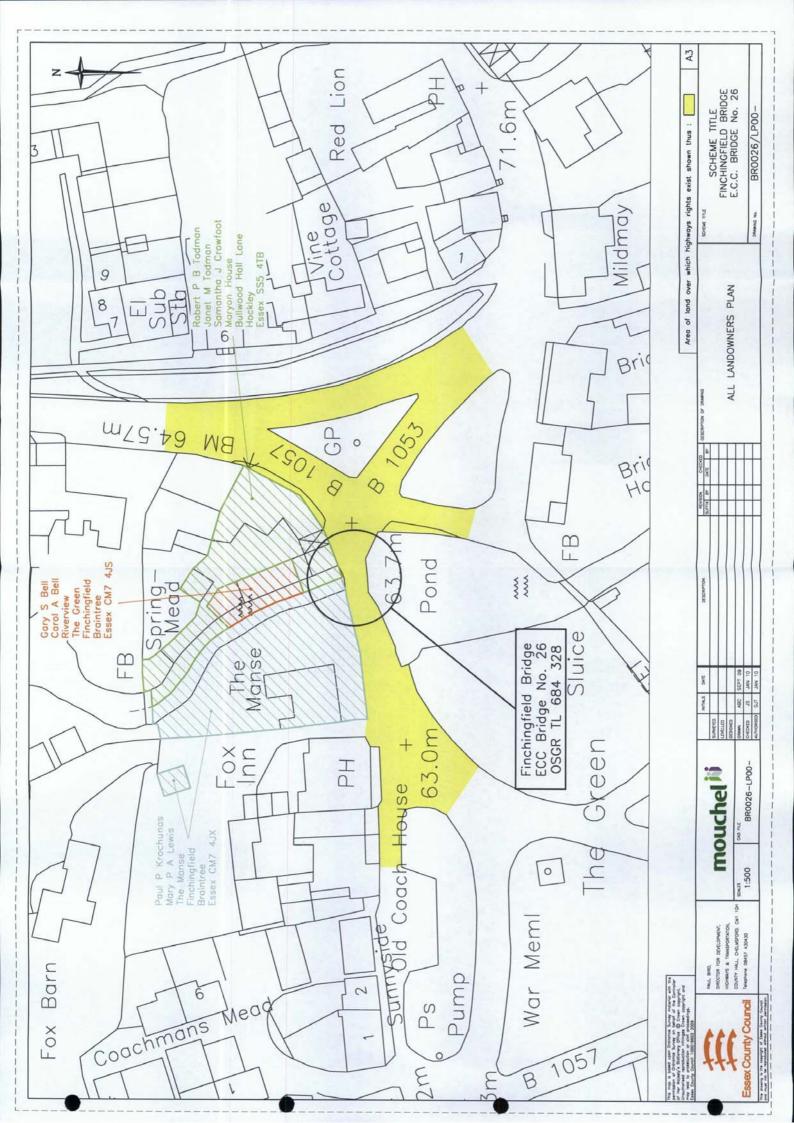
/LP00 - Land Registry Plan and Highway Boundary
